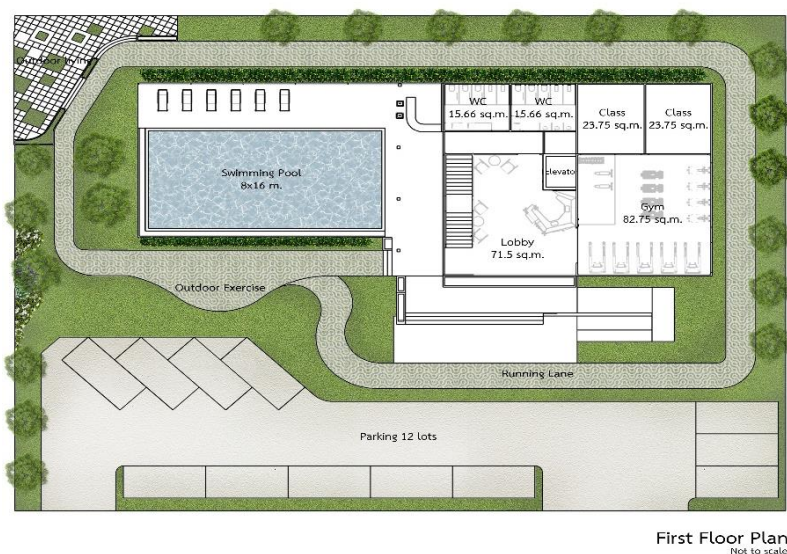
shows the model development of preventive health promoting center for elders: 1<sup>st</sup> floor plan
